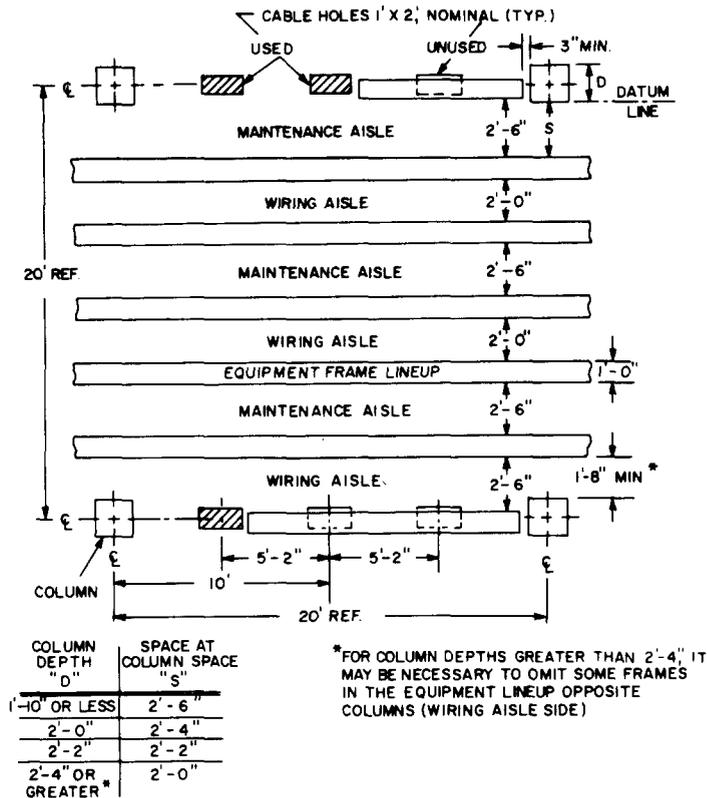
Standard Floor Plan For Principal Dept (12 Inches) Frame
